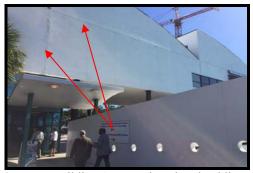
Building 1, west elevation, buckling at the seams in the stucco
